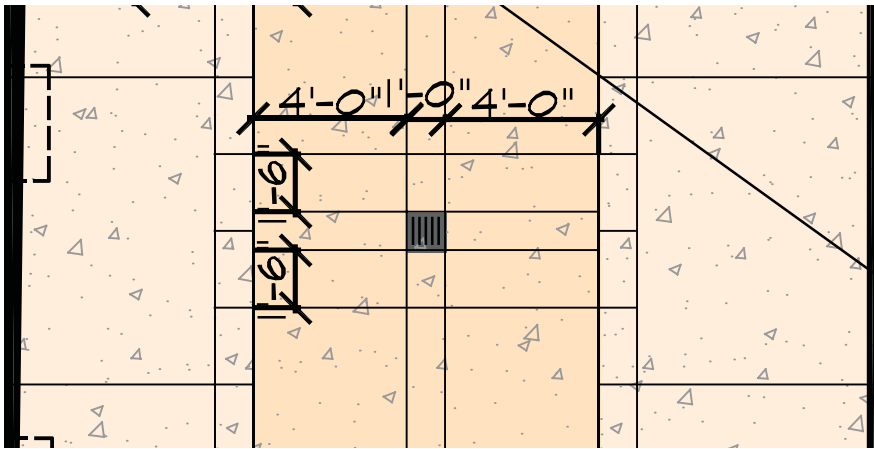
FIGURE F | Coquina Concrete street enlargement, noting placement of expansion and control joints. Note the placement of the inlet. Example shown above is south of Hypolita Street.
